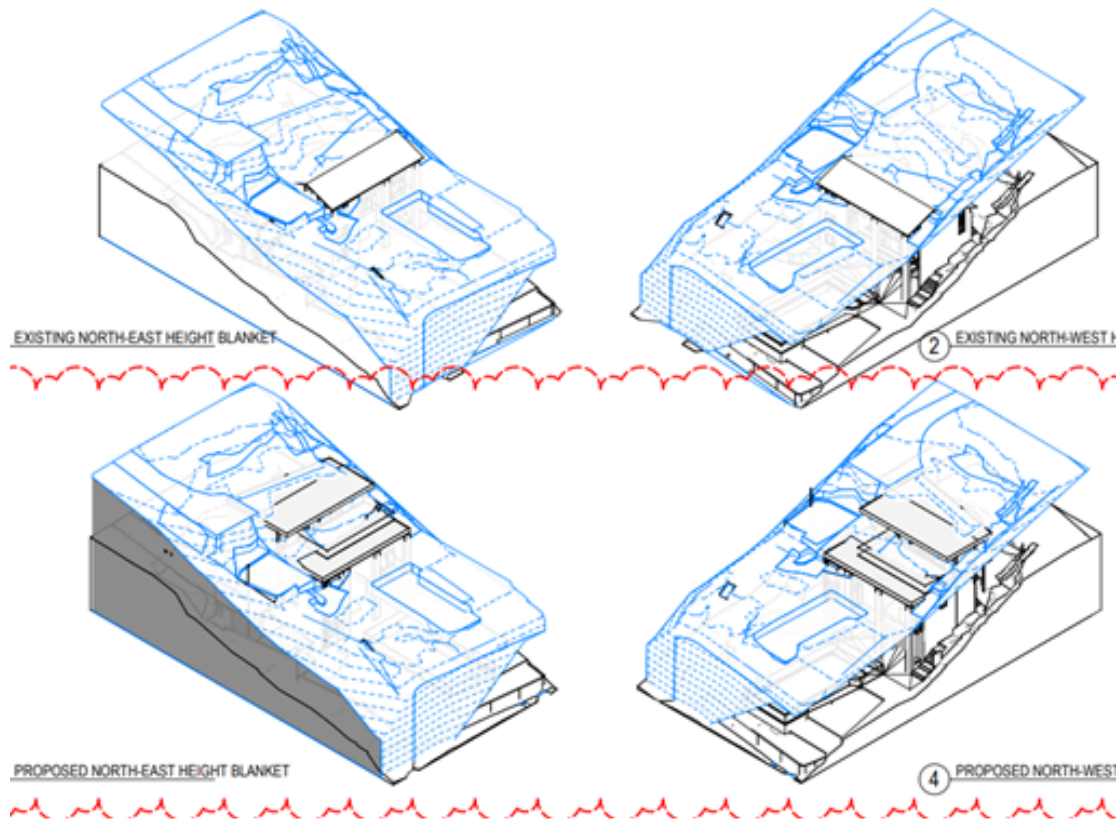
Existing (top) and proposed (bottom) Height Blanket Diagrams – encroachment to the 8.5m height requirement is shown.
